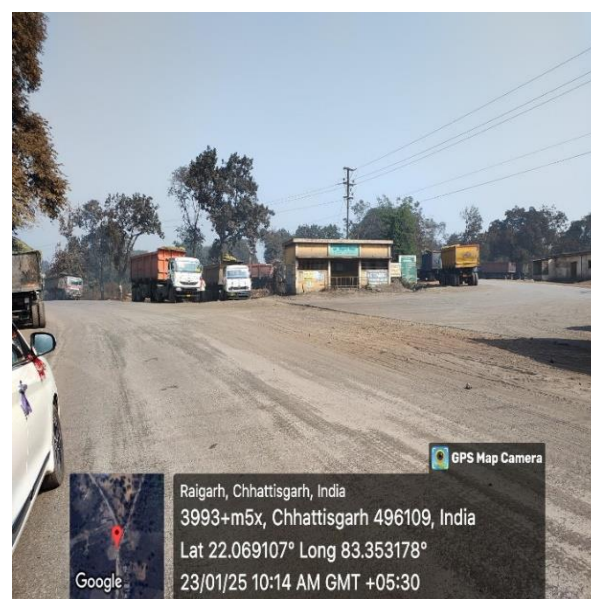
End point of the Proposed Pipeline Route 03 (L-03)
